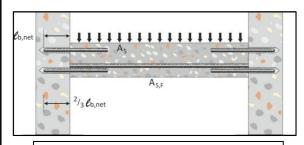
End anchoring of slabs or beams, designed as simply supported.
